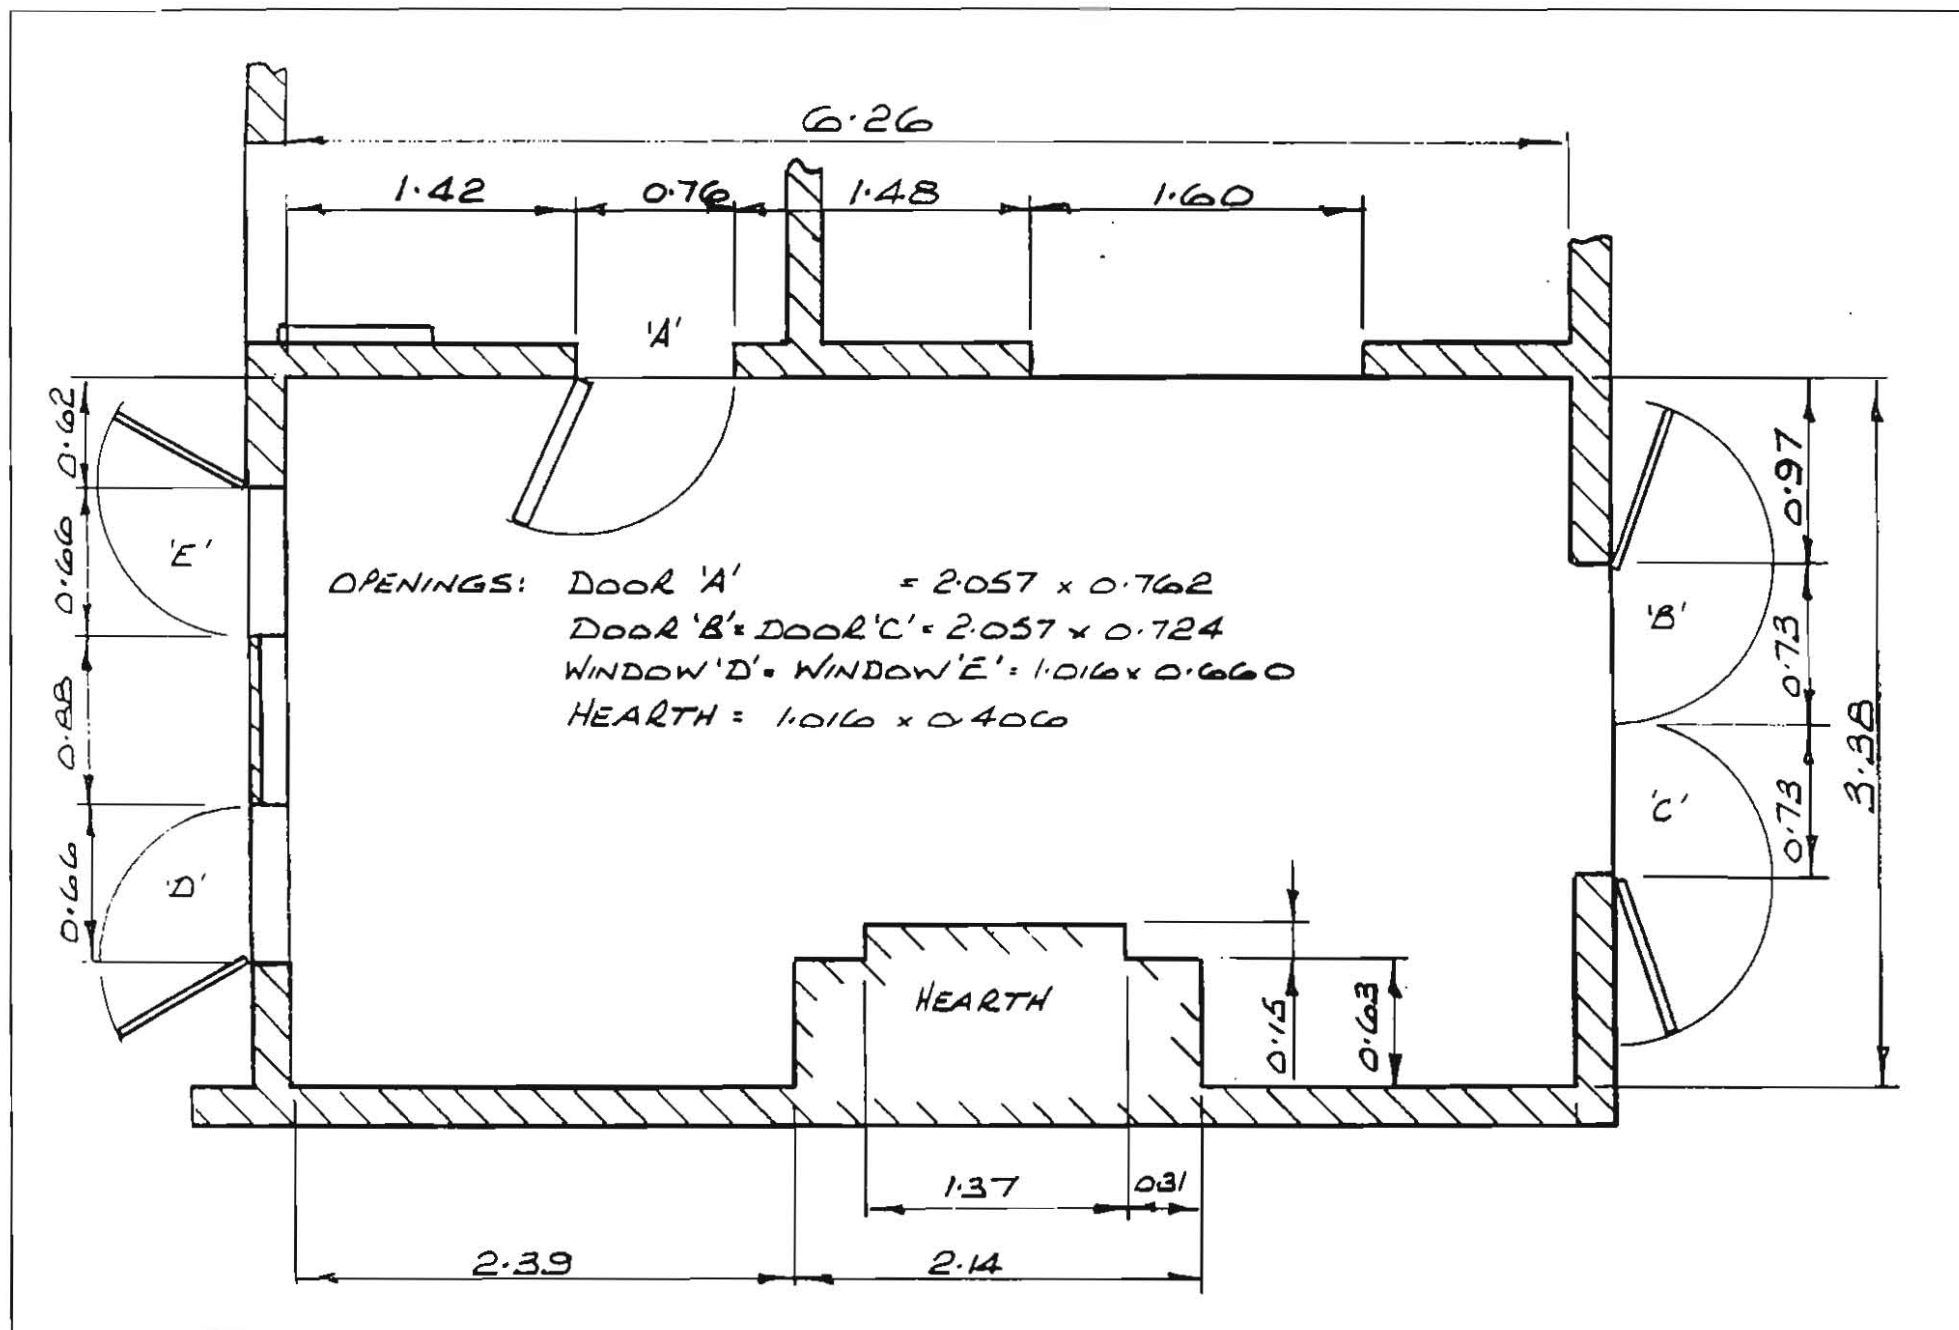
Plan View of Domestic Living Room Basic Dimensions
